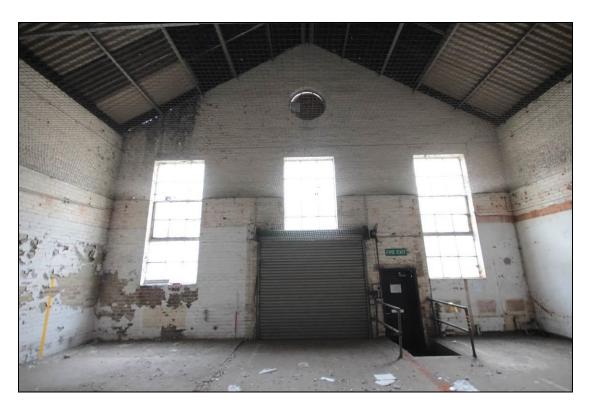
The south western internal wall, facing south west. Scale 1m. Note the brickwork on the floor to the right of this photograph. This may define an earlier access ramp.
